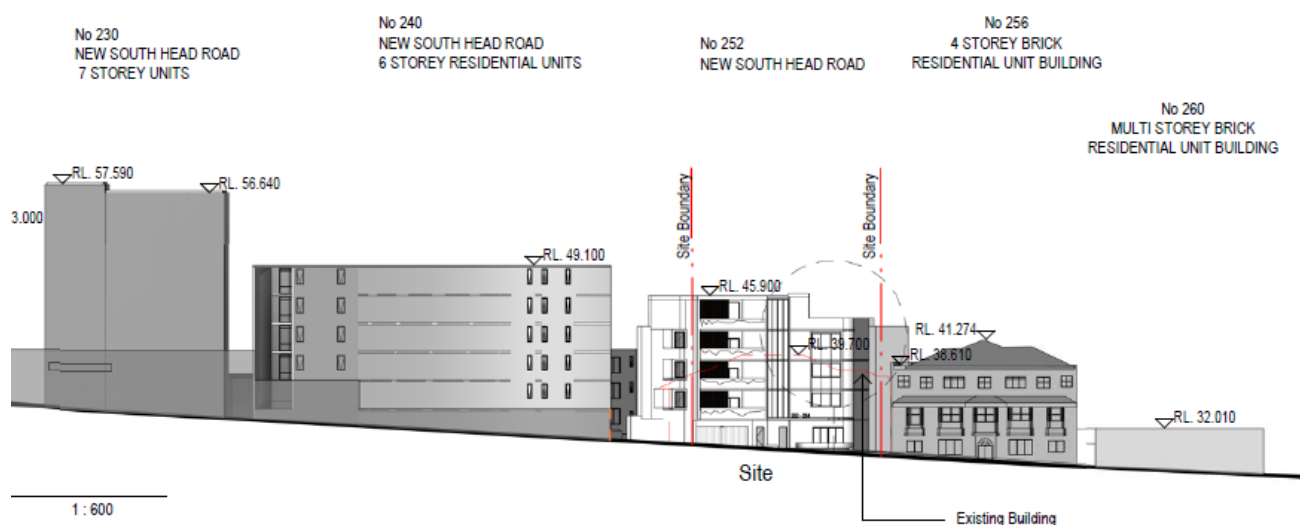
Streetscape elevation with RL 45.90 AHD building height (Source: Architectural drawing set)
